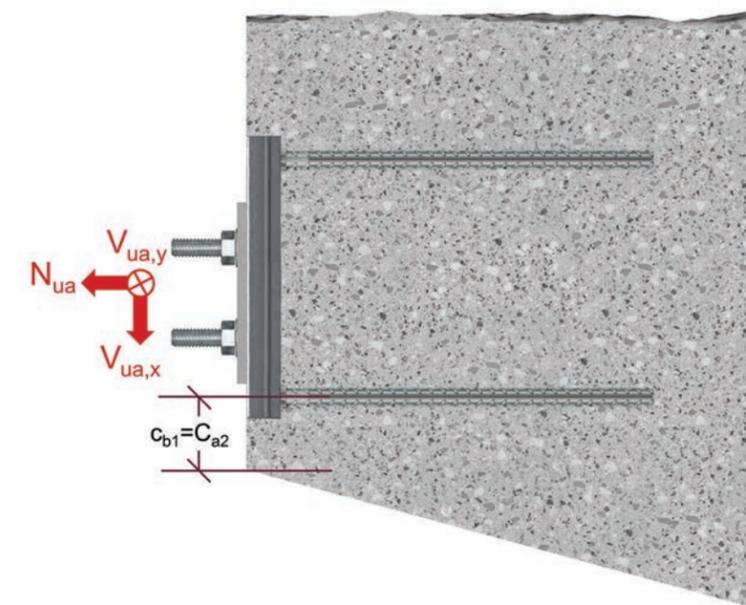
HAC CRFOS U — Single anchor channel — Obtuse angle Corner — Plan View.
